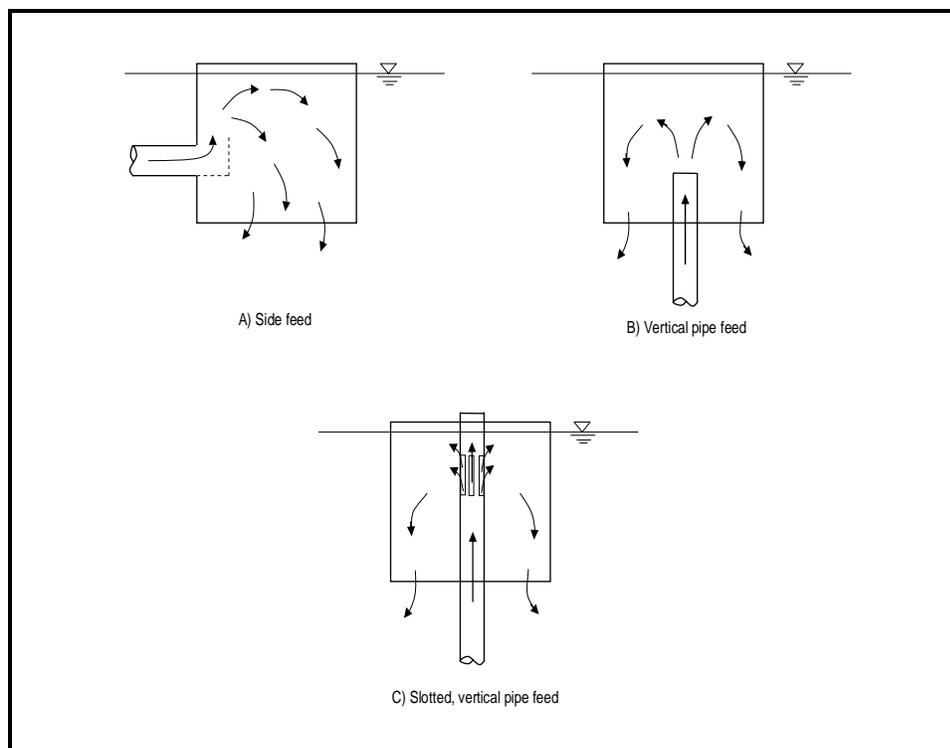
Typical Inlet Structures of Circular Center-Feed Clarifiers
